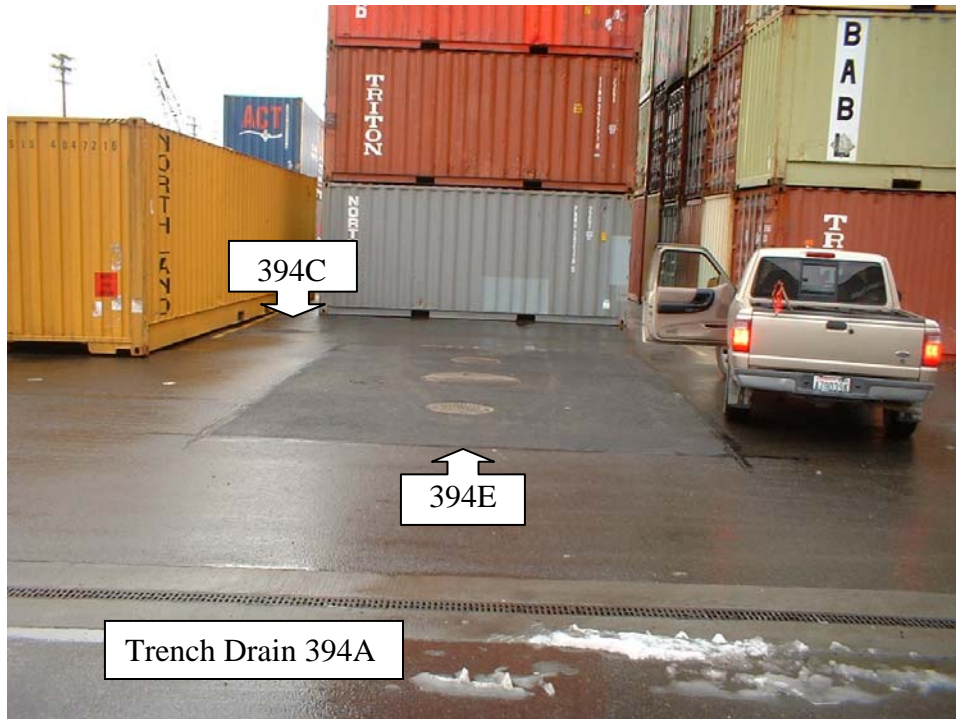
Looking SW at Trench Drain 394A, Oil Water Separator 394E, and MH 394C.
